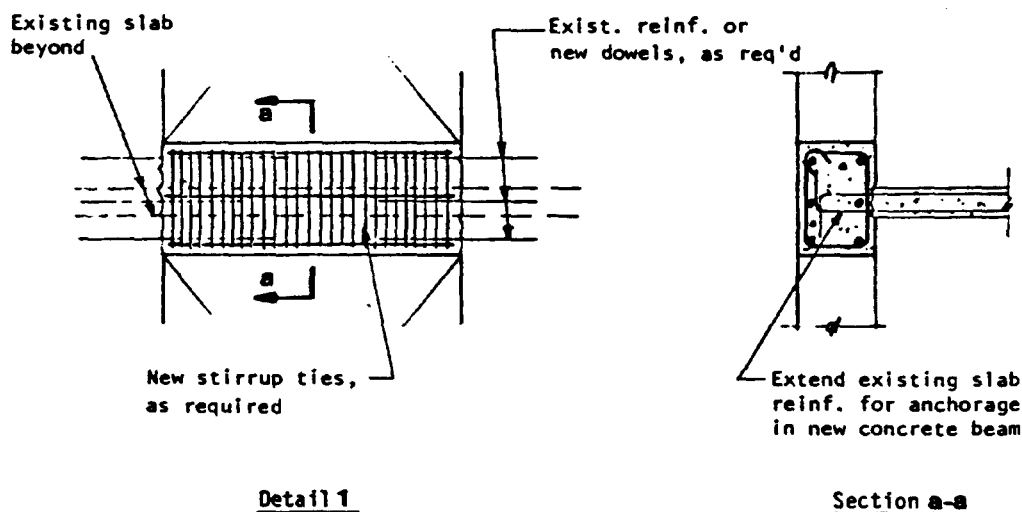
Strengthening of existing connecting beams in reinforced concrete or masonry walls
